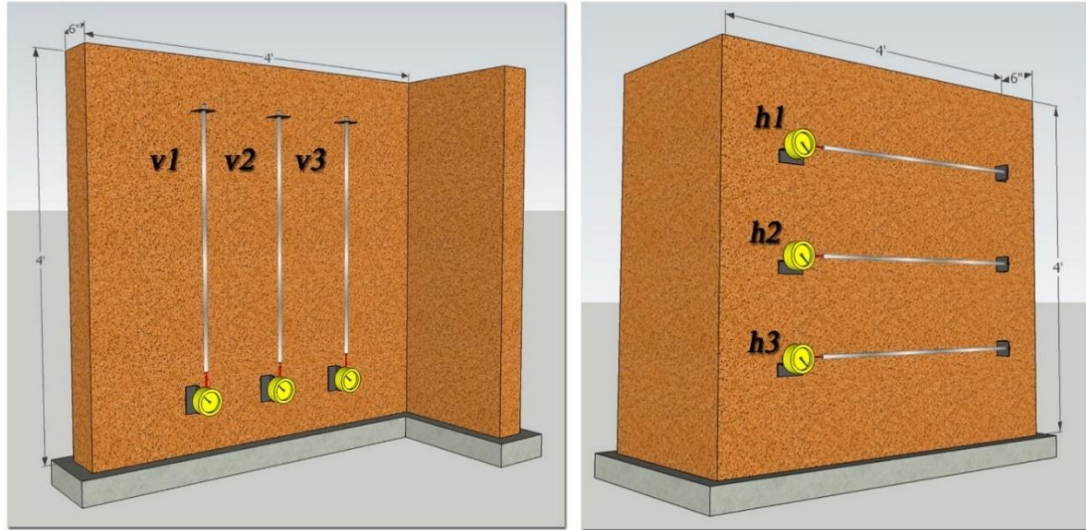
Apparatus arrangement of measuring horizontal and vertical drying shrinkage
